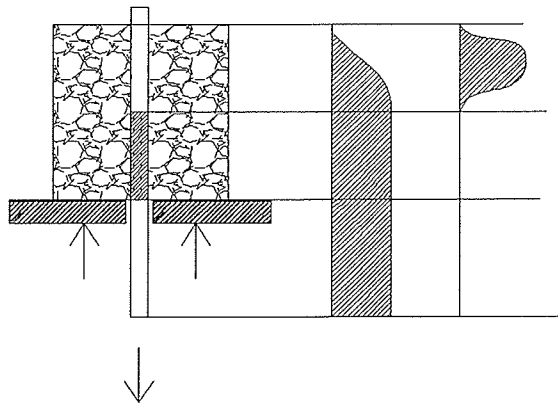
Pullout specimen: stress in steel (left) and bond stress (right)
